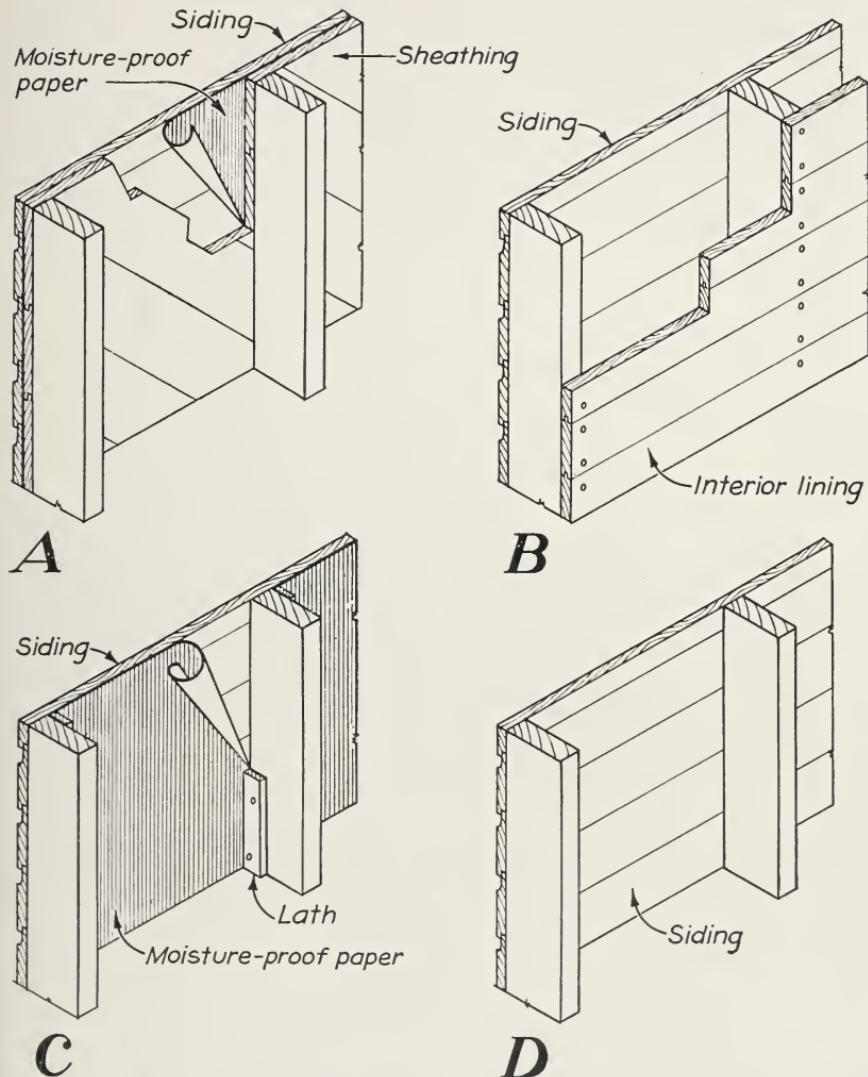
Methods of wall construction for wood bins: *A*, Wood sheathing and siding with moisture-proof paper between; *B*, double wall, siding on outside of studs, matched boards on inside; *C*, siding with moisture-proof paper lining; *D*, siding without lining.
